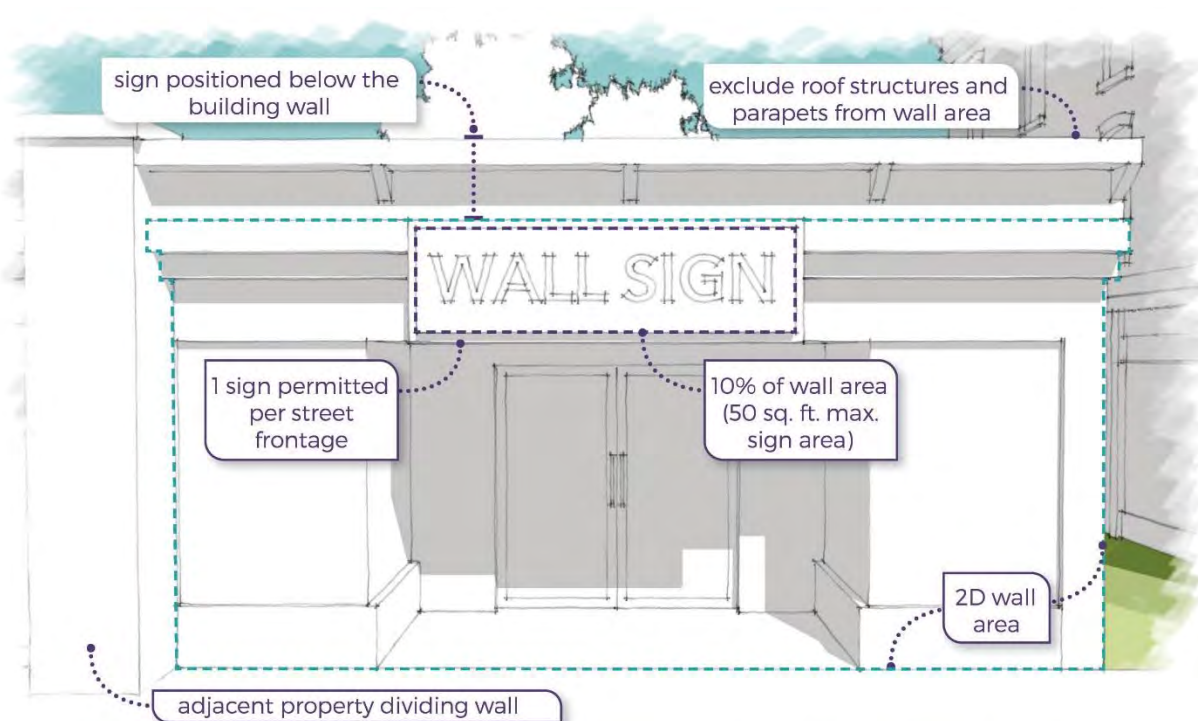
A. SIGNS PERMITTED IN NONRESIDENTIAL DISTRICTS: WALL
